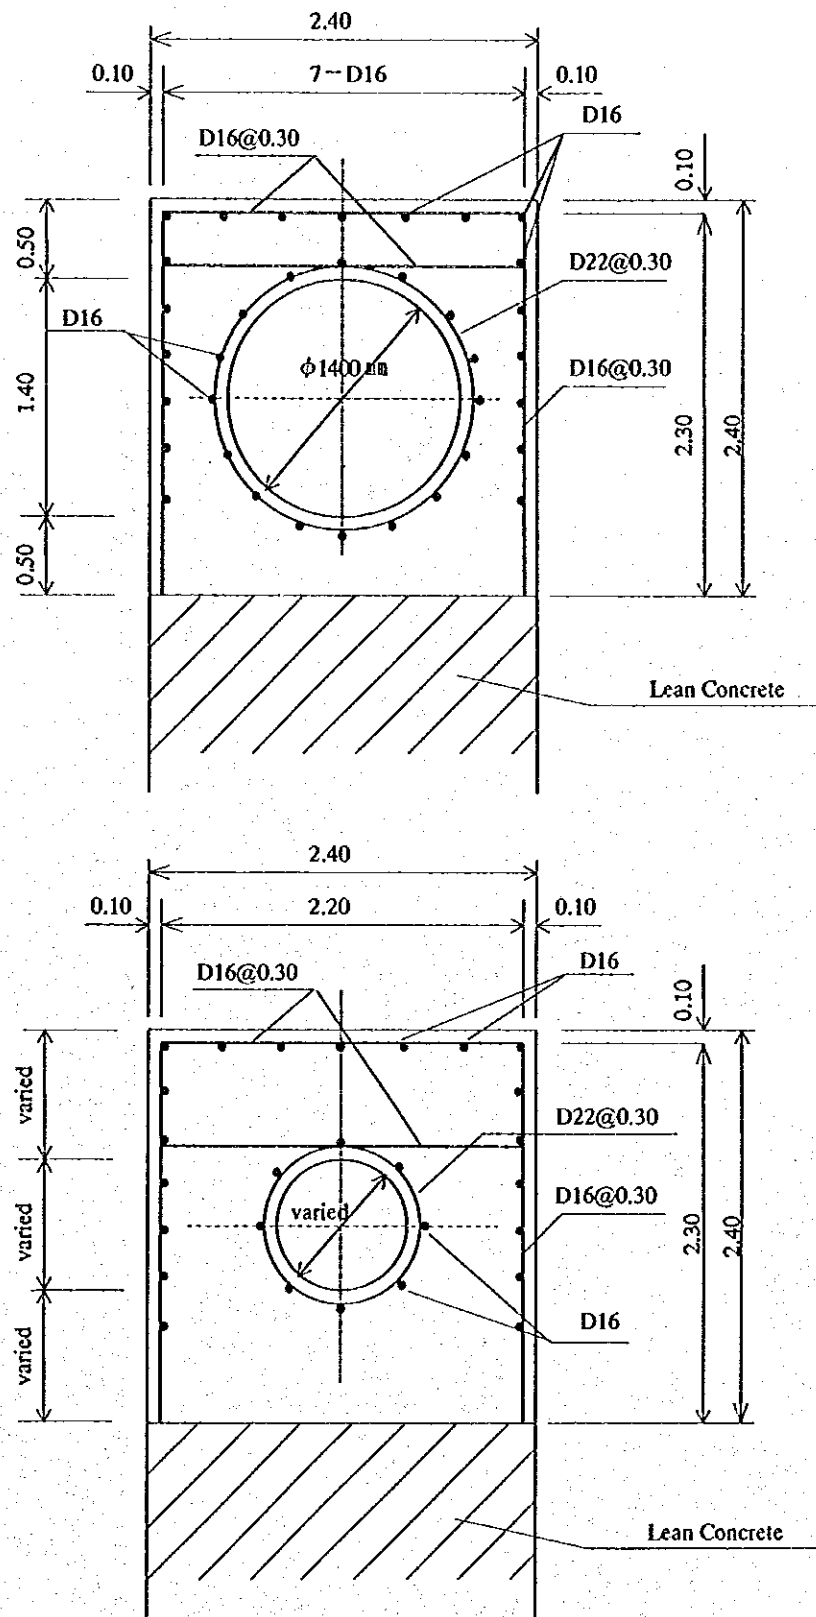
Reinforcement Arrangement of Lining Concrete of Penstock (Generating Portion)
